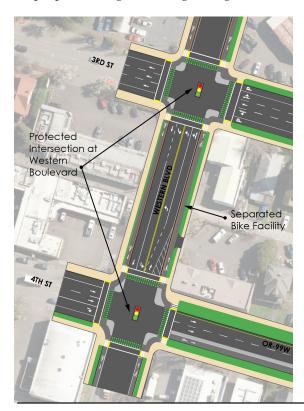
Western Boulevard Protected Intersections at 3rd Street & 4th Street
